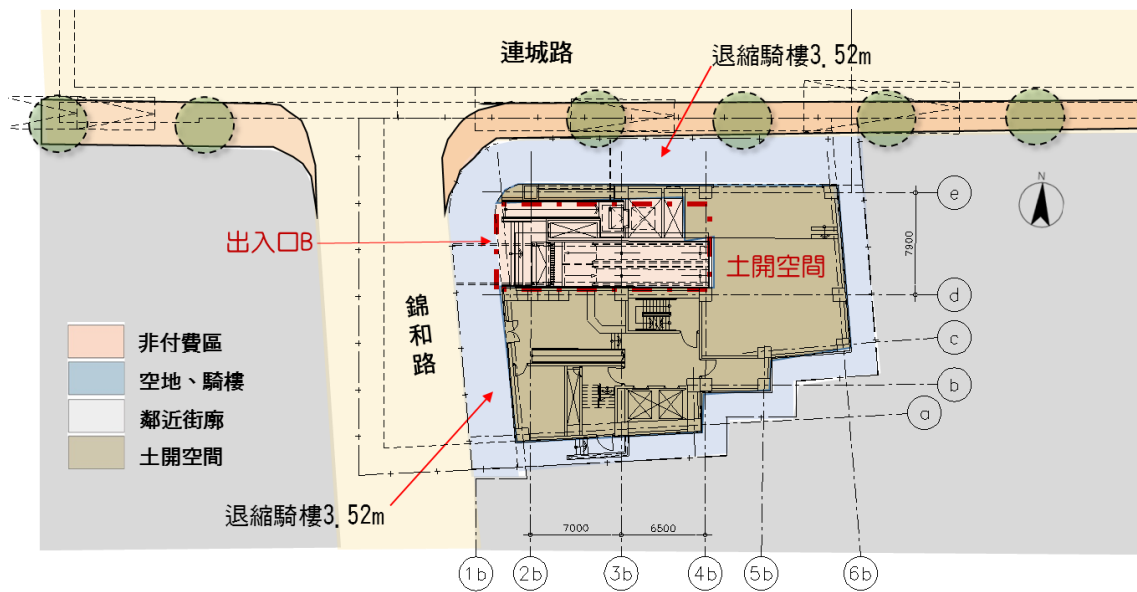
Station LG07 Entrance B Floor Plan
